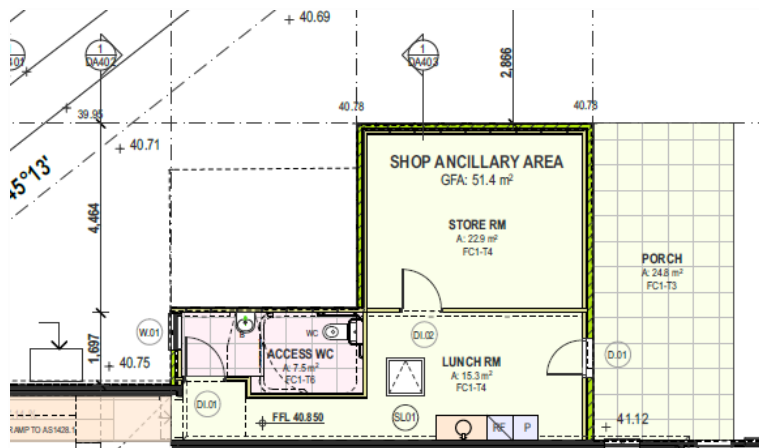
APPROVED FLOOR PLAN FROM DA-172/2017
